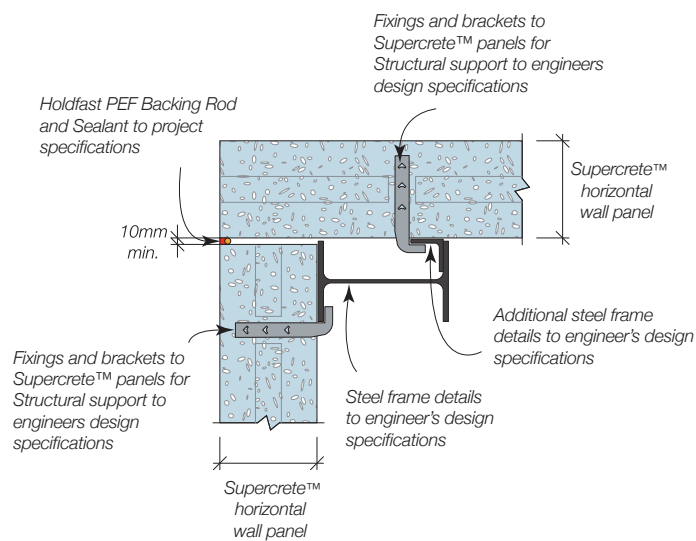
Horizontal wall panels straight line wall junction detail.
